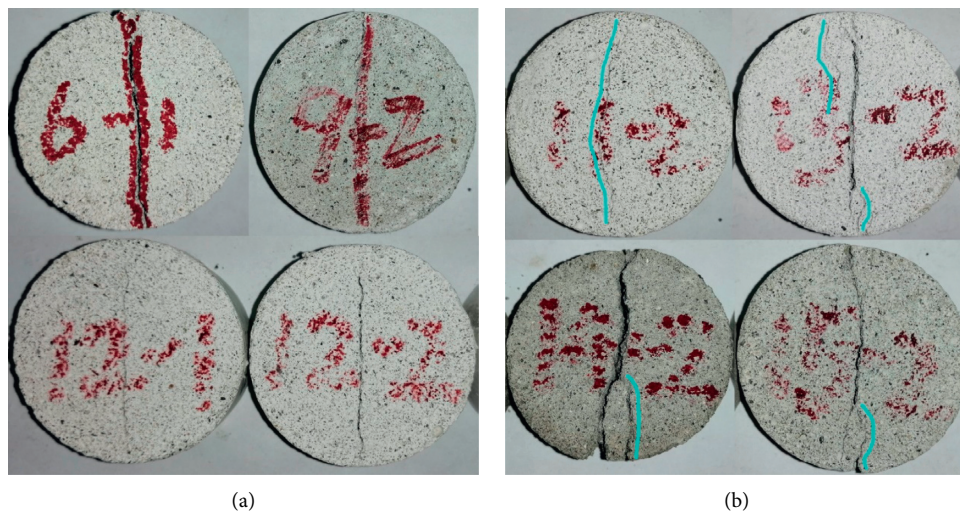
Splitting failure modes: (a) typical splitting failure mode; (b) untypical splitting failure mode.
